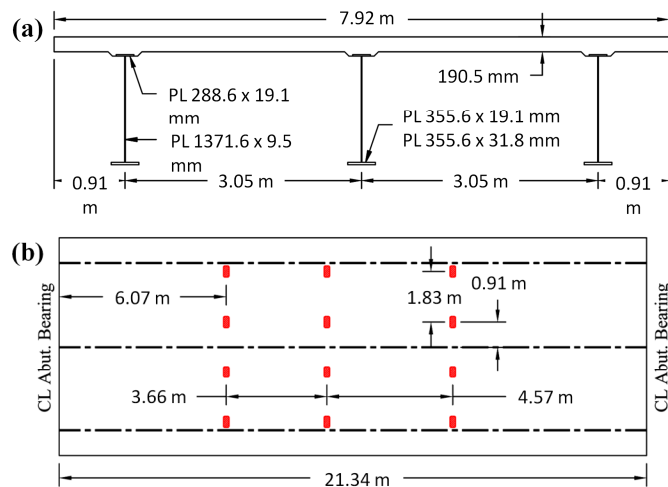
Nebraska laboratory test: (a) cross section, (b) loading configuration
